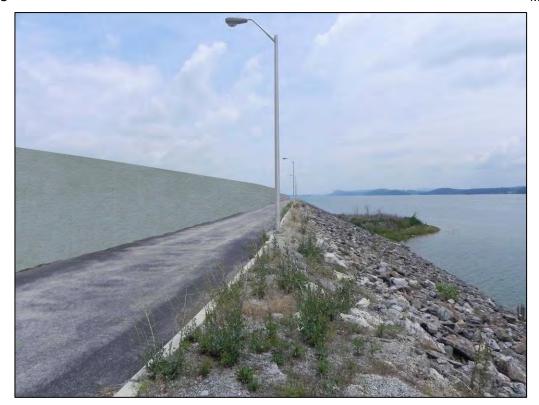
Visual Rendering of a 6.6-foot-tall floodwall on the downstream side of Segment C-2 at Cherokee Dam. The Proposed Segment C-1 Floodwall would appear very similar to this rendering.
